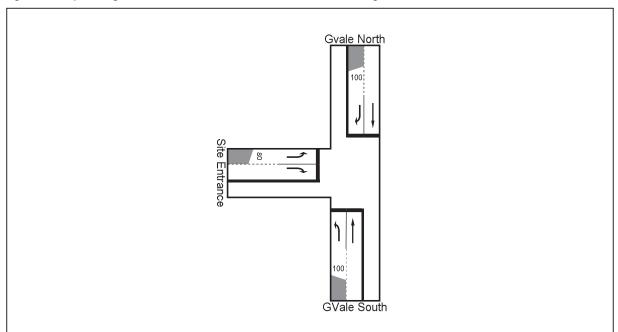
Proposed Signalised Intersection at Grahamvale Road Site Entrance Signalised Intersection
